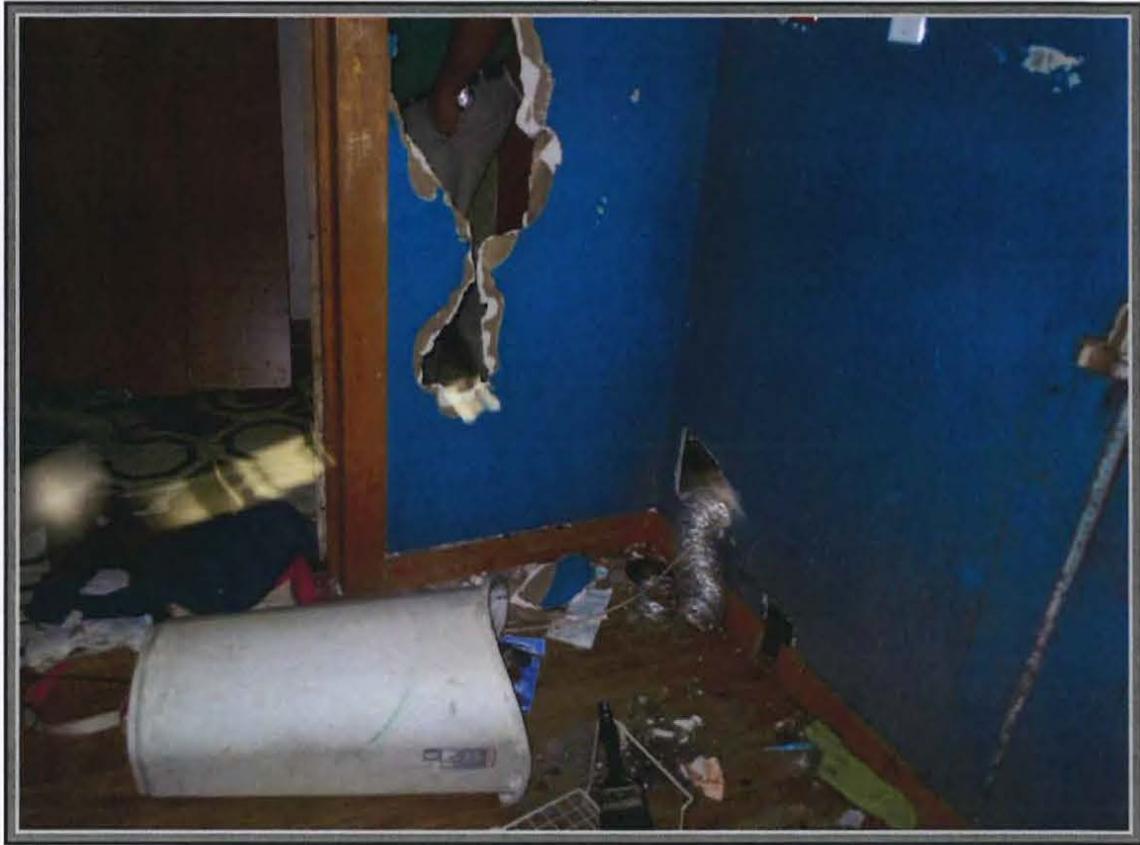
Non-code compliant exposed wiring creating hazardous conditions and damaged walls.
